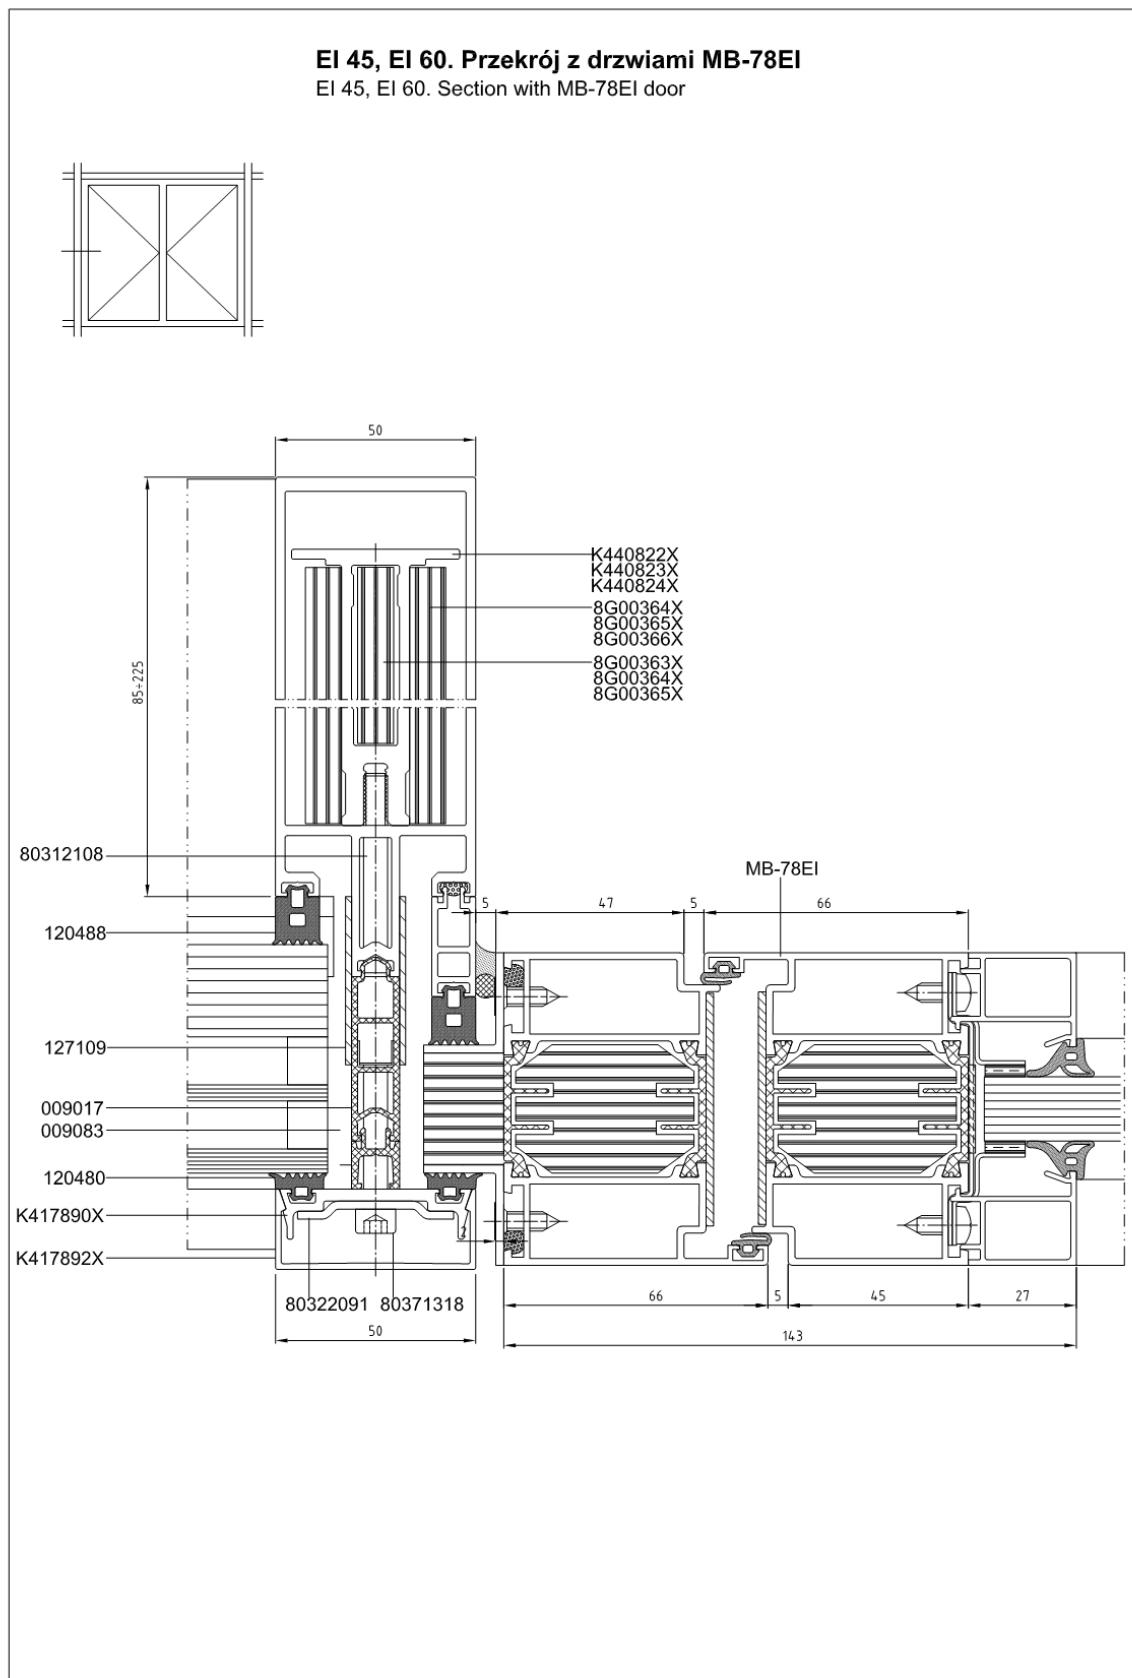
Installation scheme of the MB-78EI system door fixed in the MB-SR50N EI EI60 system wall (fixing details according to the MB-78EI door system classification –
